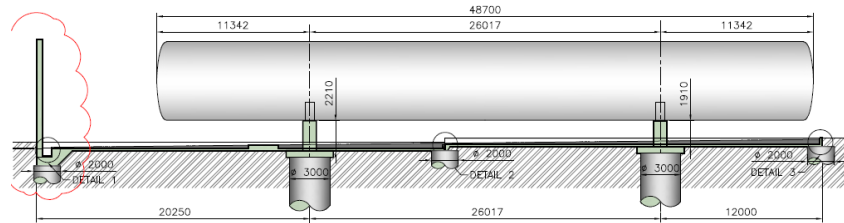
Cross section of the jet grouting reinforcement for the LNG bullet tanks.
